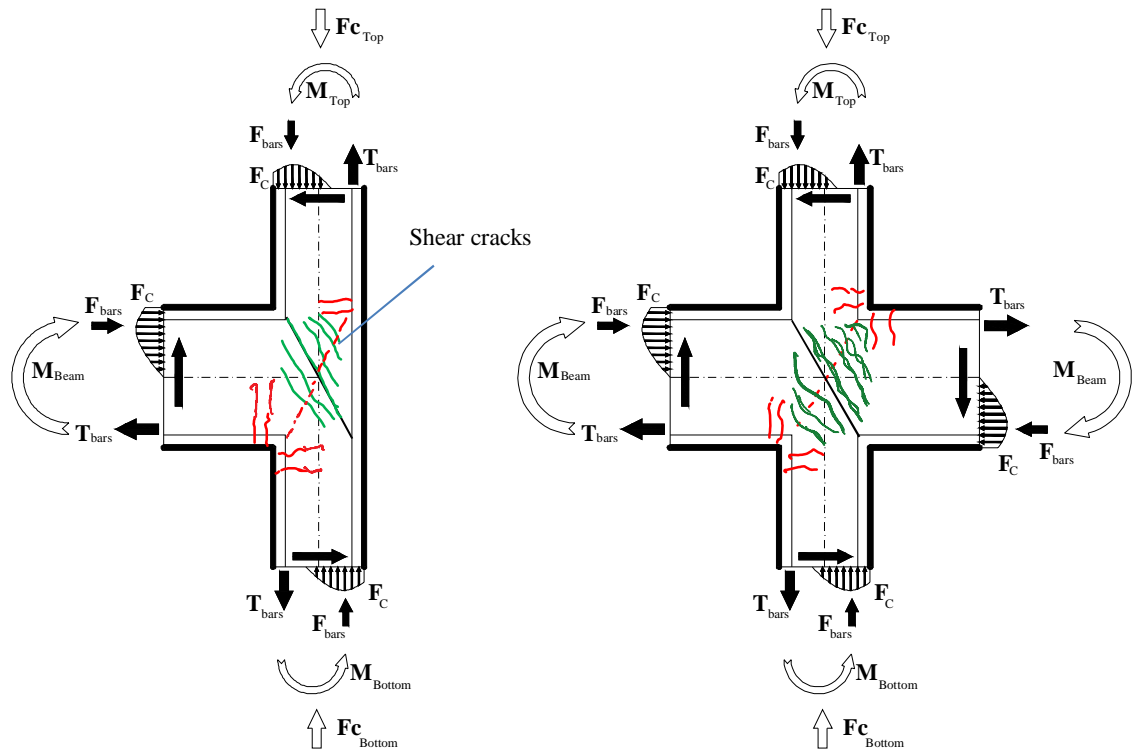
Exterior (left) and interior (right) beam-column joints under seismic loading
